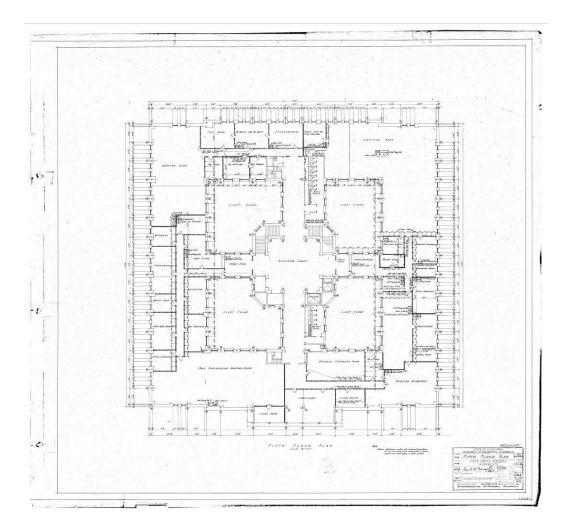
OB 1 Fifth Floor Plan. April 20, 1926.
